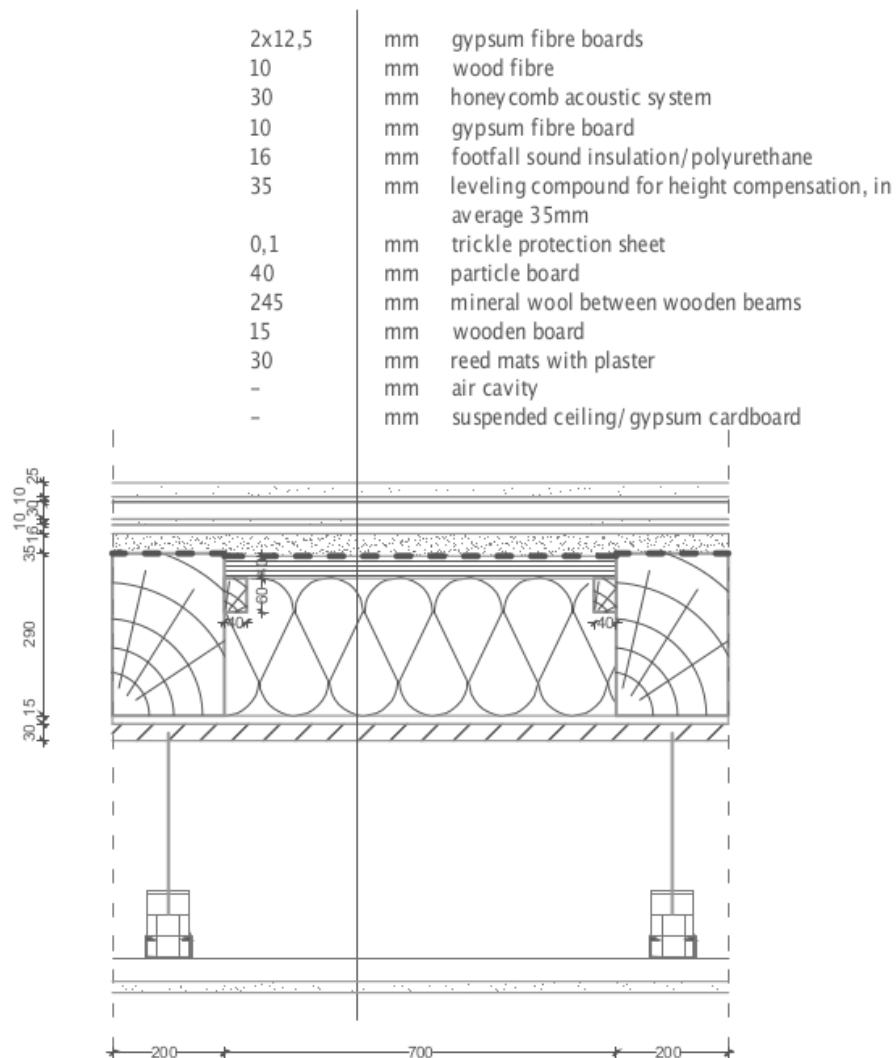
First refurbishment construction (c), new upper floor system on top of the wooden beam construction
